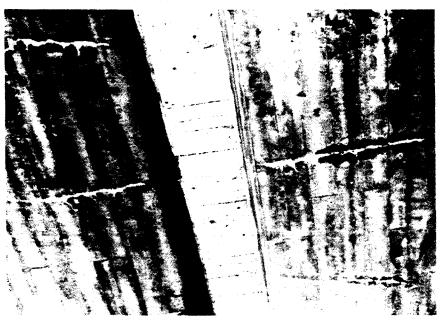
Cracking in Concrete (Note Efflorescence)
